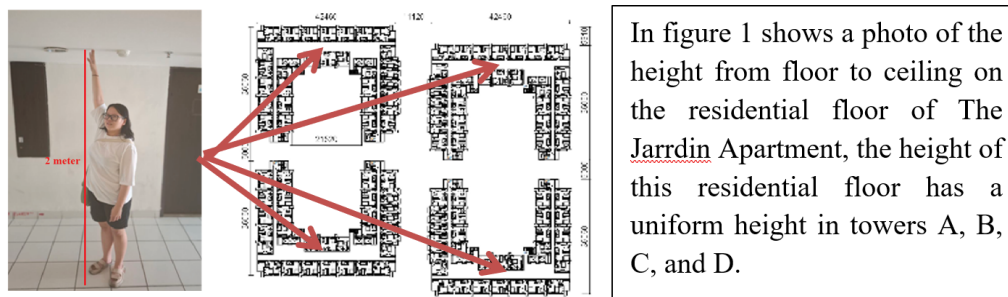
Ceiling Height Position in The Jarrdin Apartment
